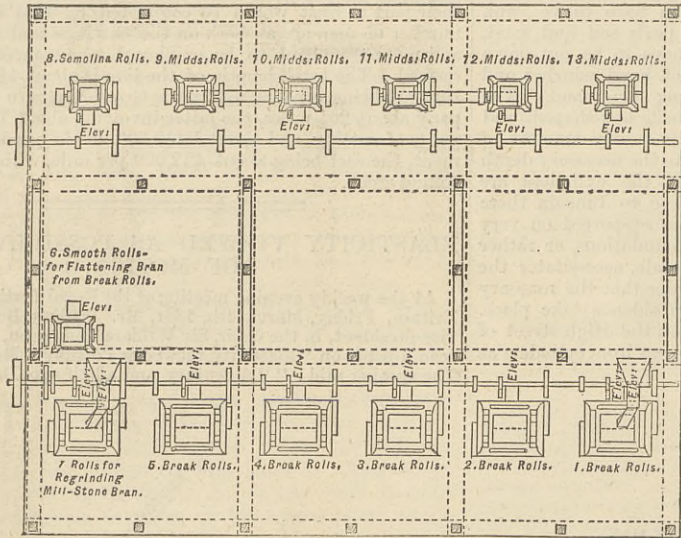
Carter's Exhibition Plant, Plan Ground Floor.
